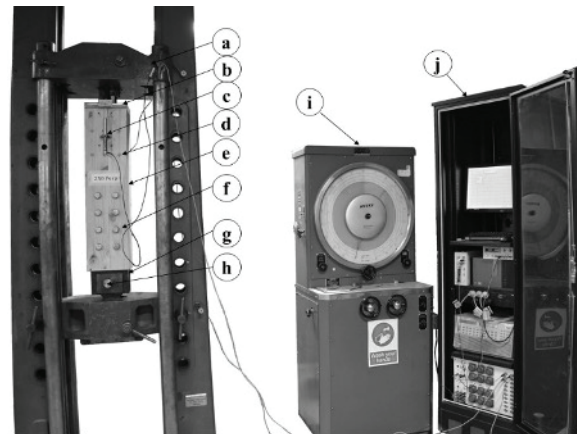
The rod pull-out test set-up: (a) 1000 kN Avery machine, (b) steel pulling part, (c) LVDT, (d) reinforcement screws, (e) CLT specimen, (f) M20 bolts, (g) supporting knife plates, (h) pin, (i) analogue load indicator, (j) data acquisition system.
